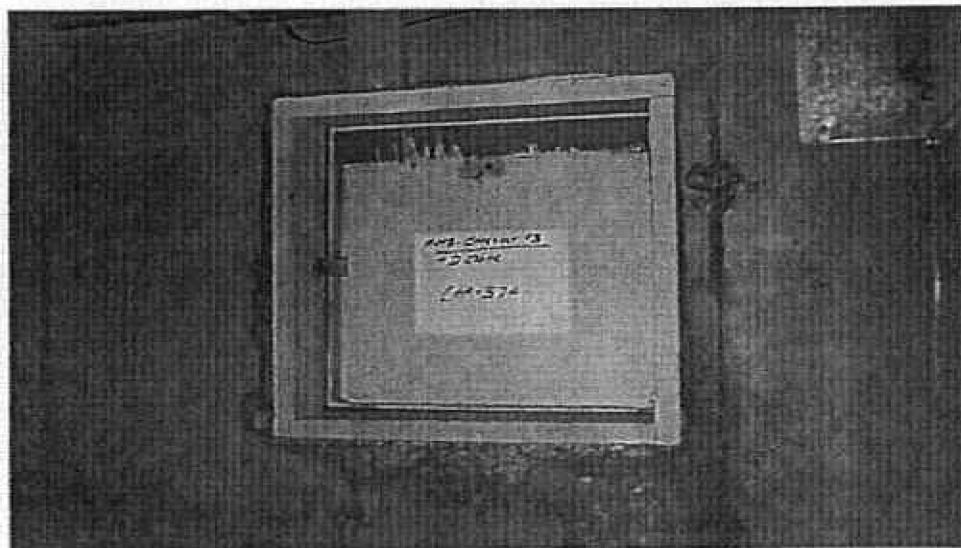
White Metal Crawlspace Access Hatch (LHA-57A)
